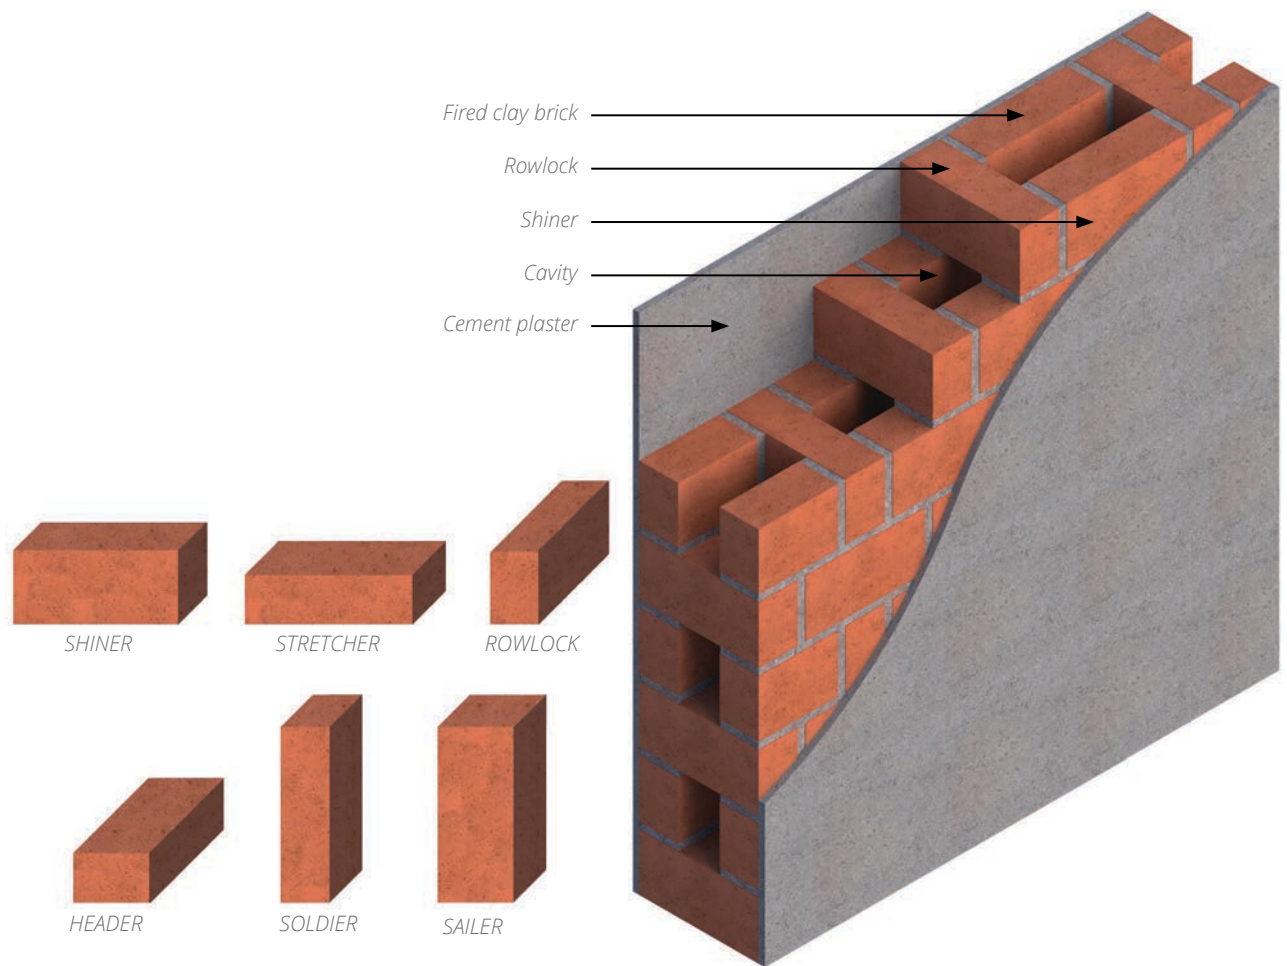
Different brick faces used in wall construction (left) and 3D illustration of a typical Rat-trap bond Wall (right).
